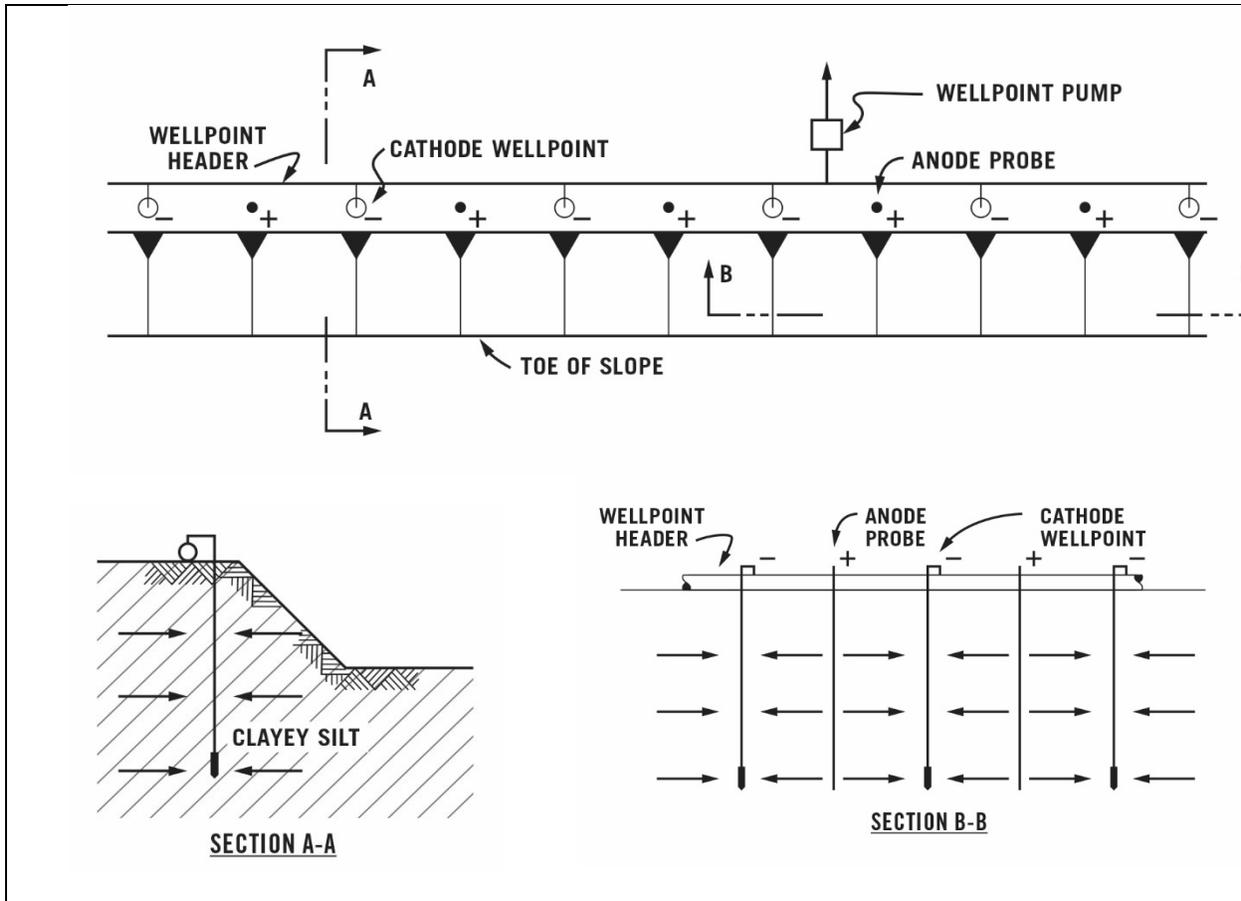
Electro-osmotic wellpoint system for stabilizing an excavation slope (Adapted from TM 5-818-5)
